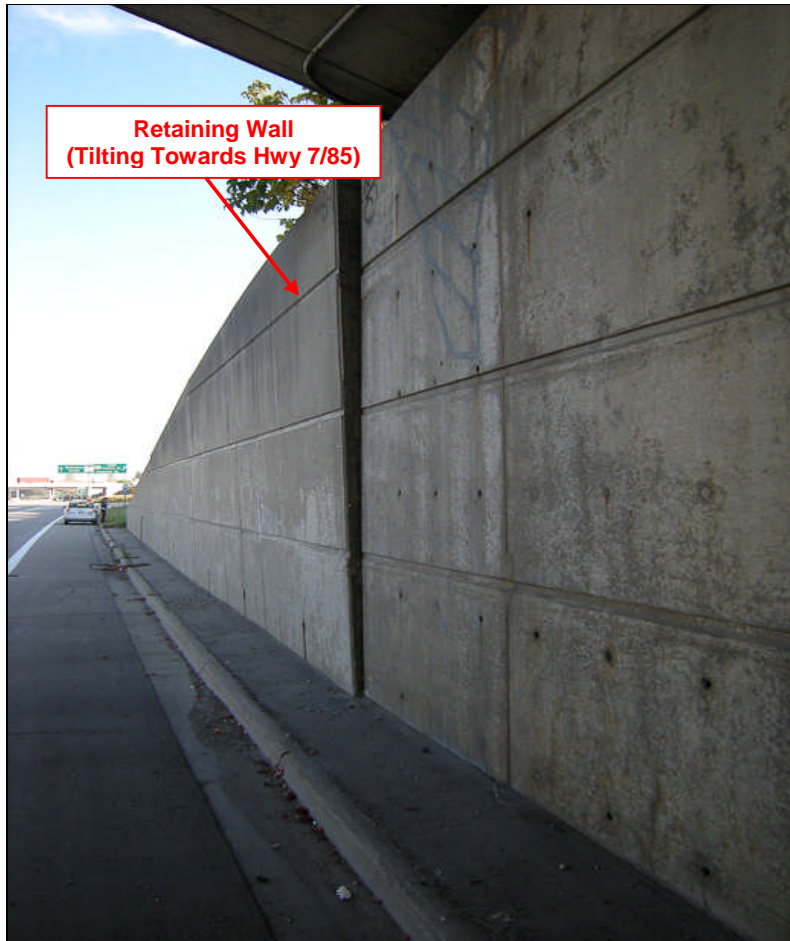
Looking north from south portion of retaining wall. A double catch basin is located about 14 m north from south end of the retaining wall. (October 8, 2011)
